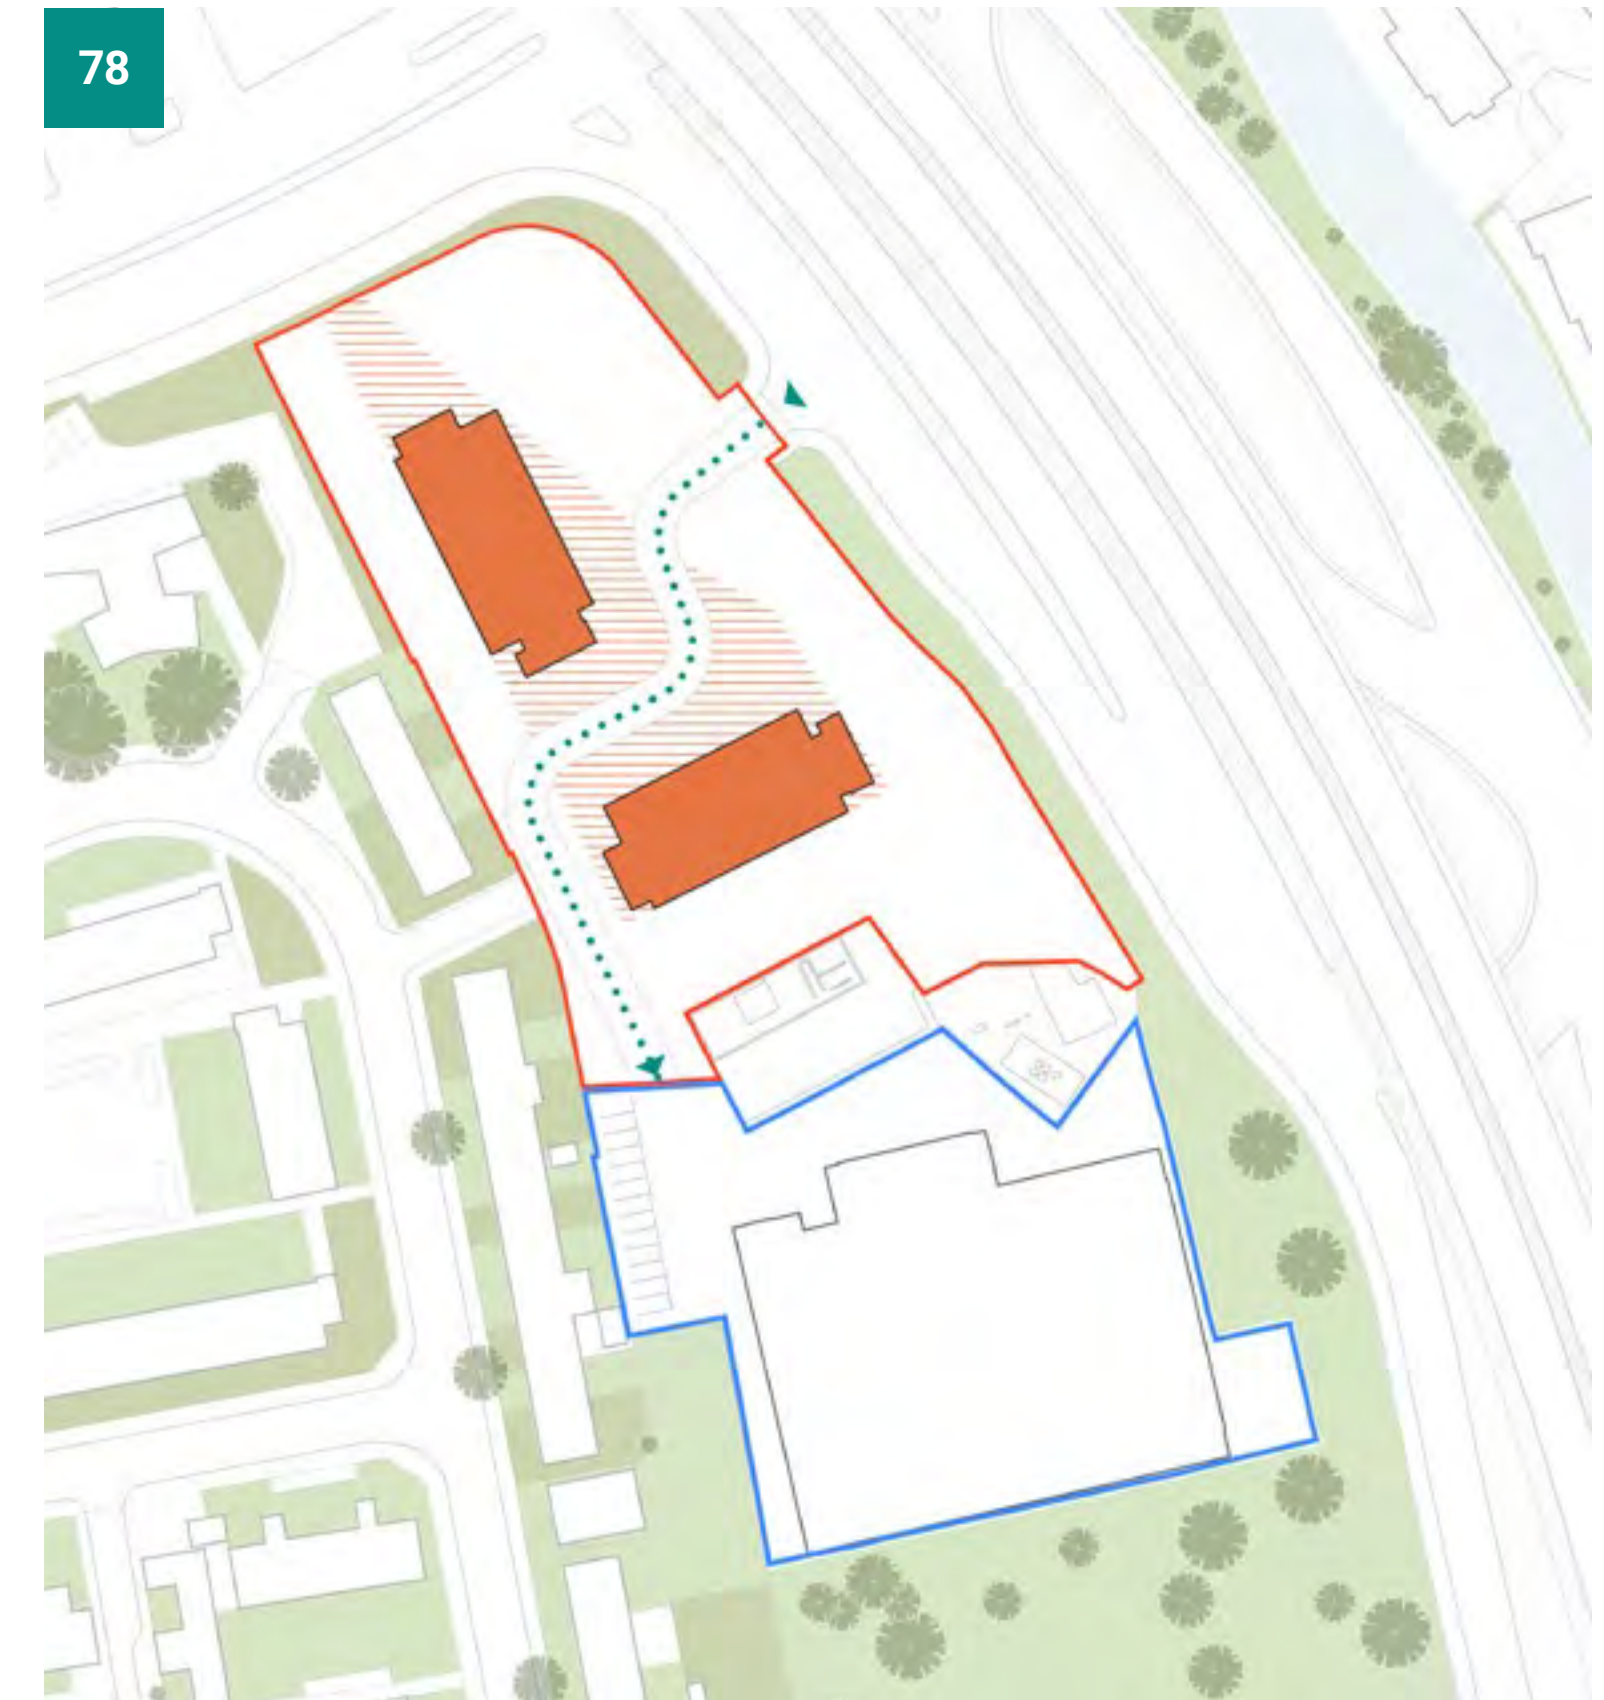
BUILDING FOOTPRINT DIAGRAM
